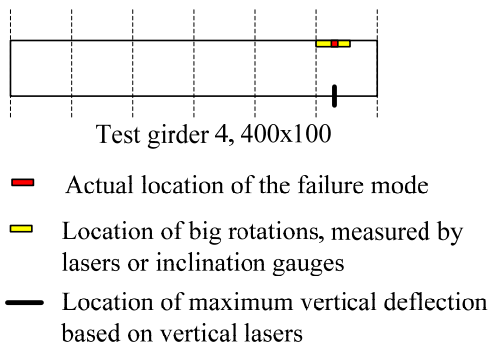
Location of the final failure mode of test girder 4, 400x100
